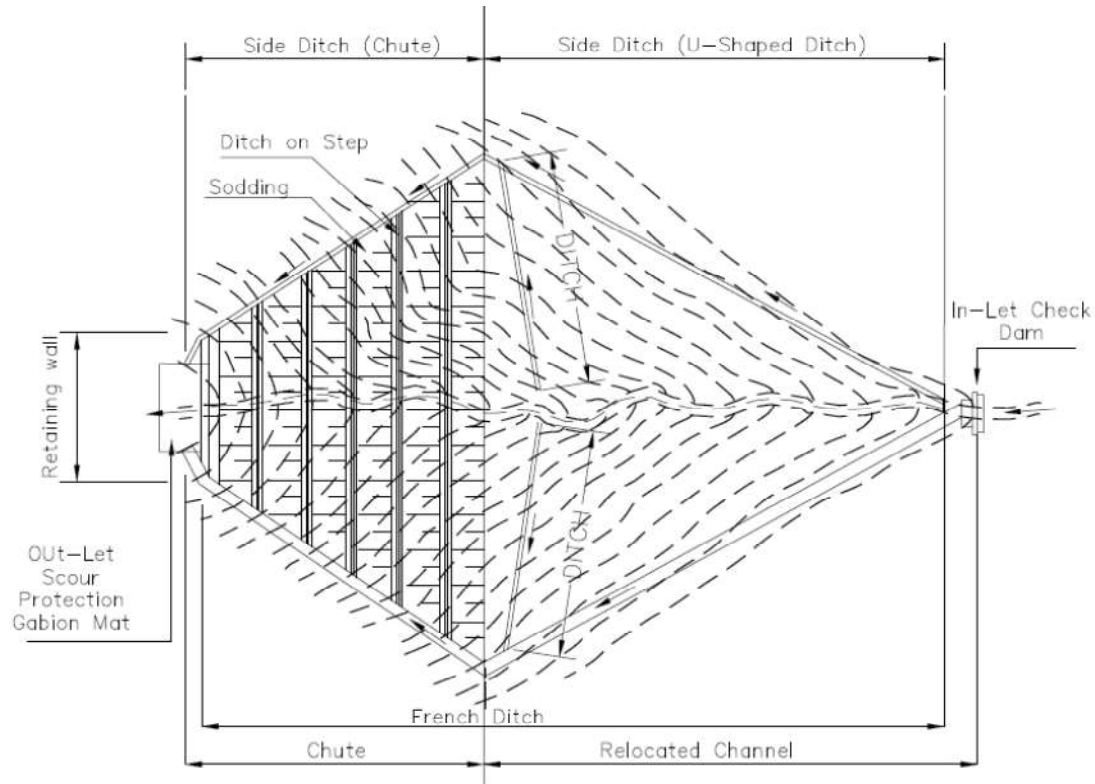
(a): Typical Arrangement for Spoil Banks: Plan
